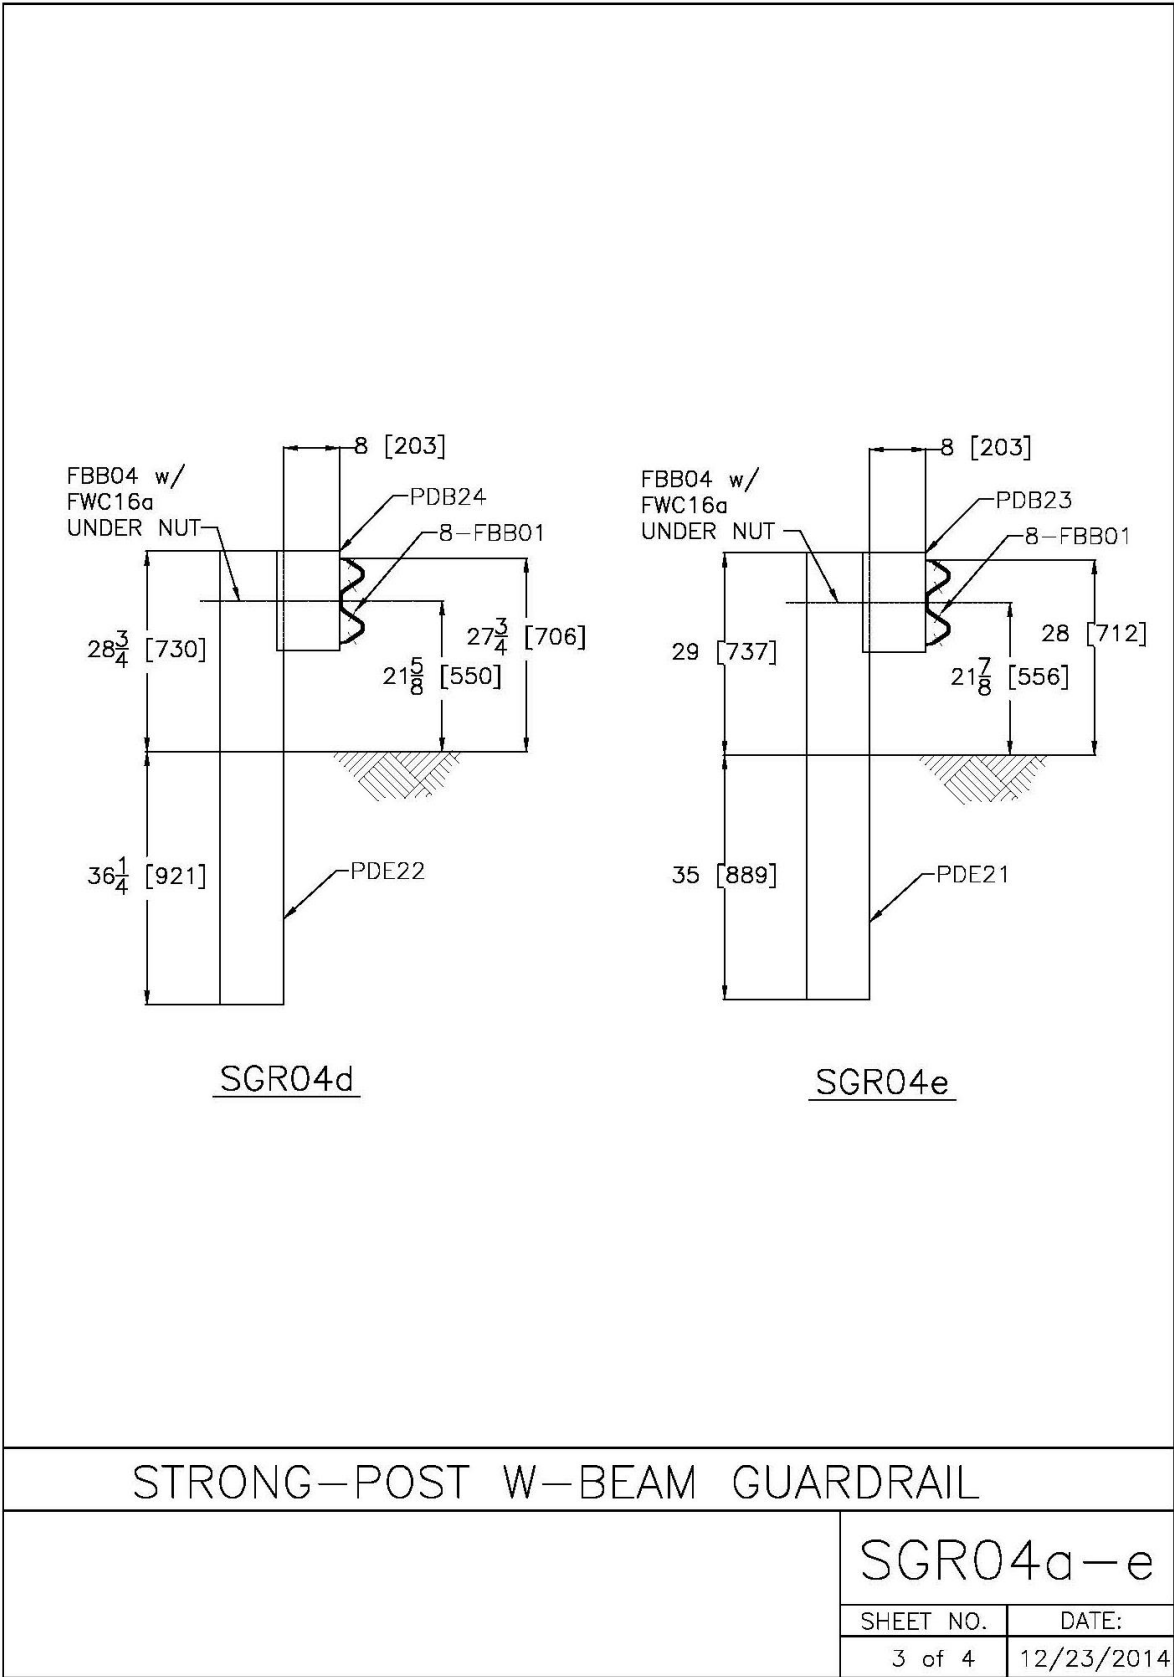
G4(2W) Guardrail System for Use with Round Posts, Sheet 3
